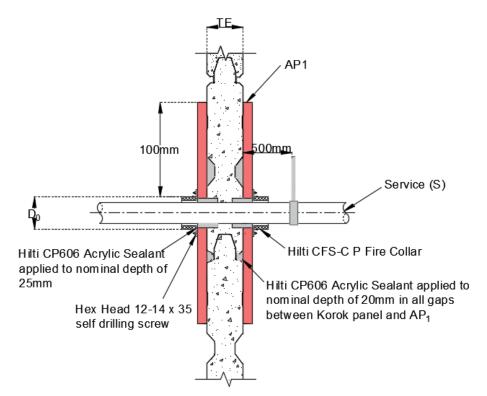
uPVC/uPVC-SC plumbing pipes < 150 mm in Dia. through 78 mm Korok panel system with additional protection
